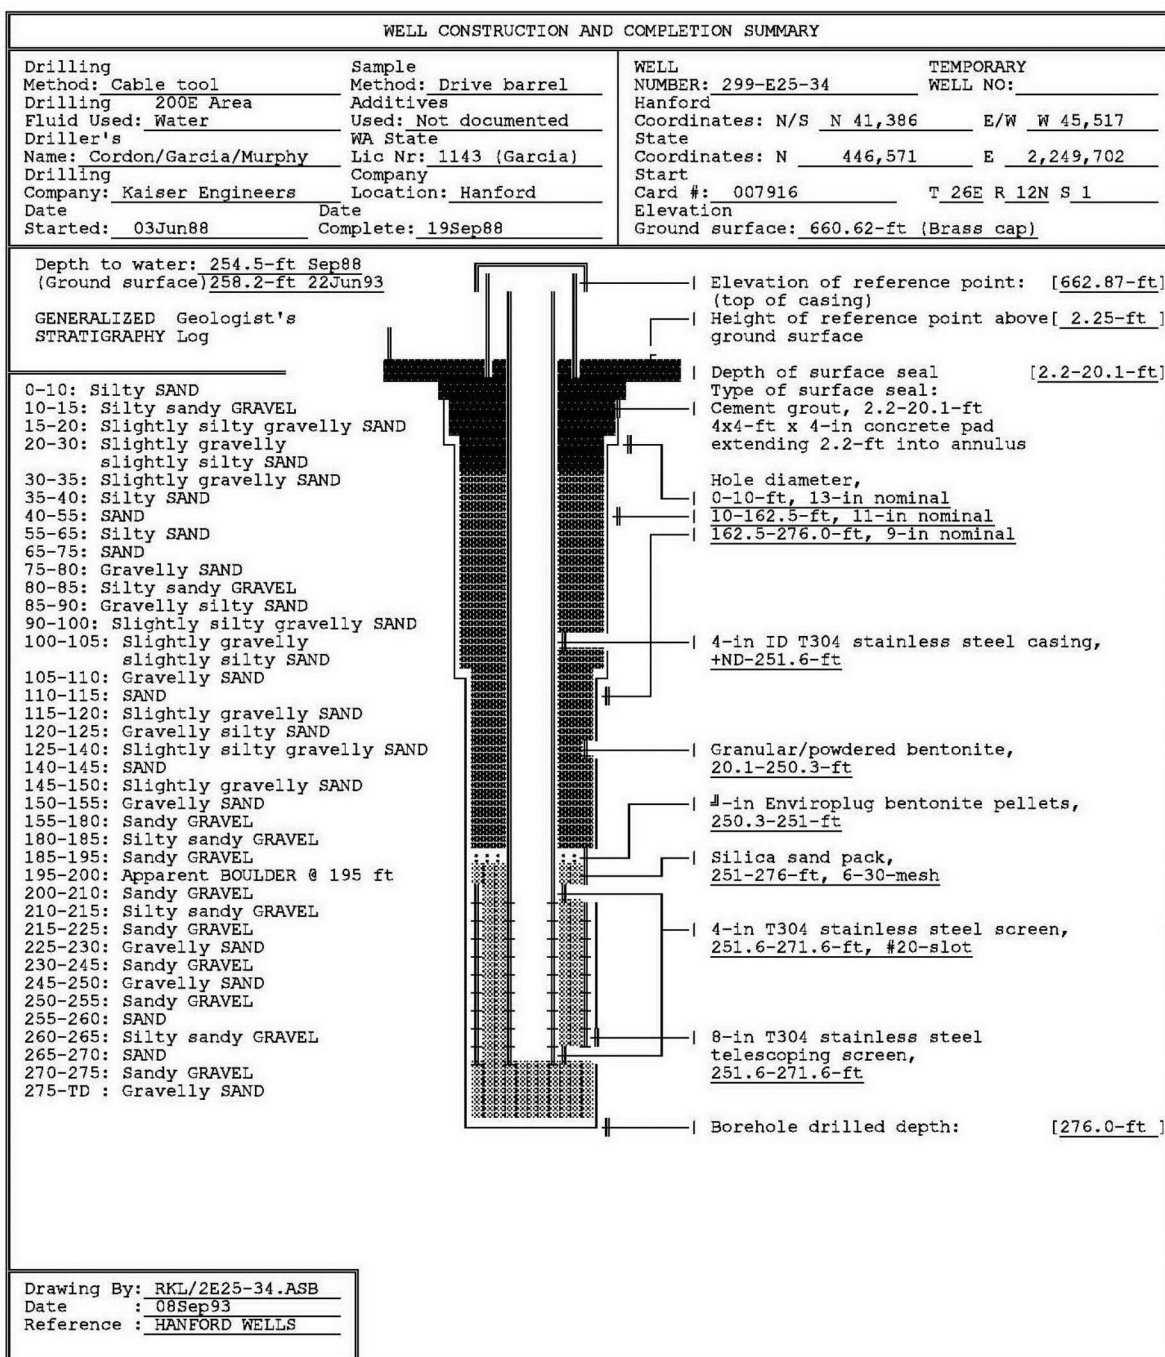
Well 299-E25-34 Construction and Completion Summary
